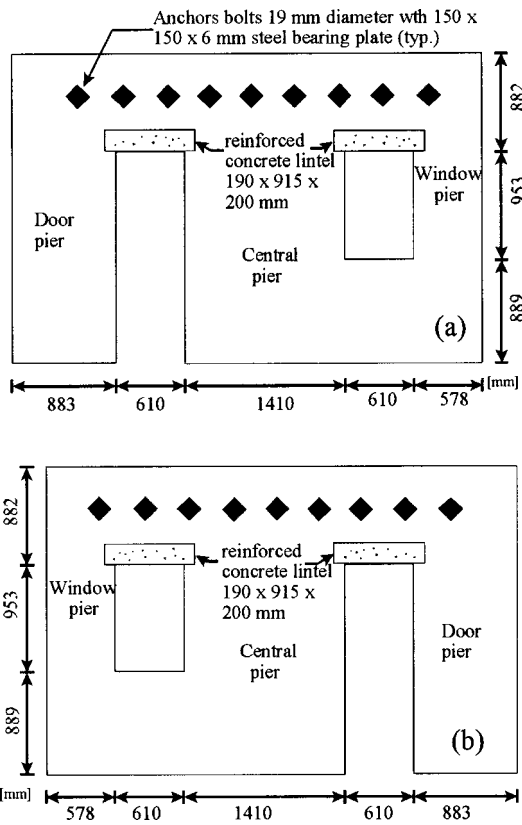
Elevation of URM specimen (parallel to loading): (a) east wall and (b) west wall
